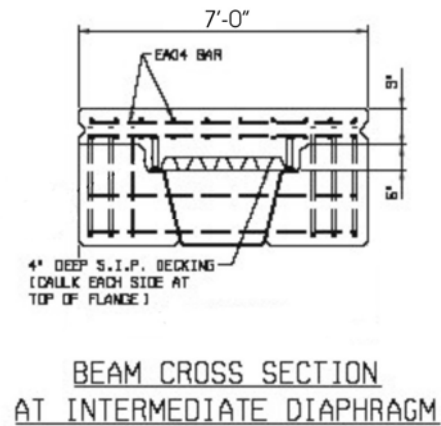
Composite Cold-Formed Steel Plate Box Girder System
